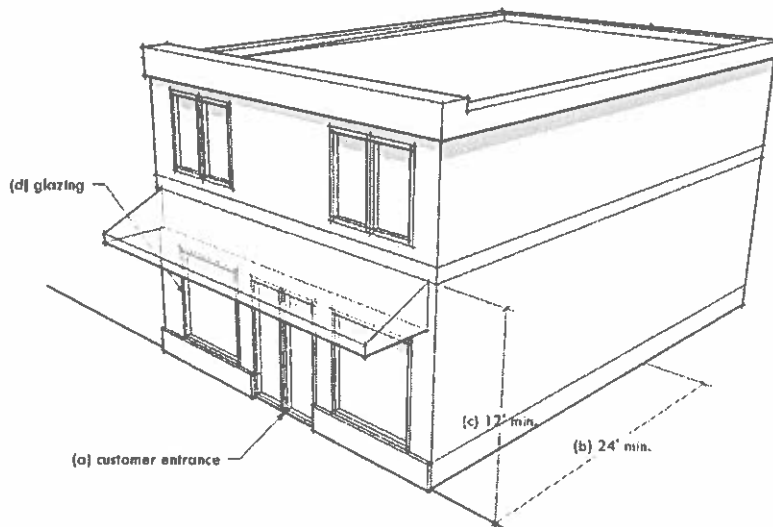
Along an active edge, a building must be designed to accommodate pedestrian-oriented non-residential uses (illustrates active use area).
